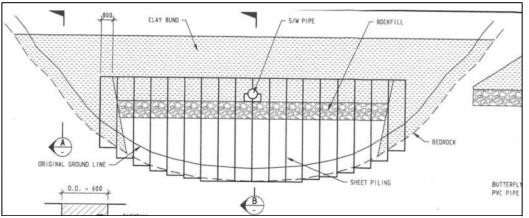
Schematic elevation of cut-off wall (image courtesy of Royds Consulting Limited (1995))
